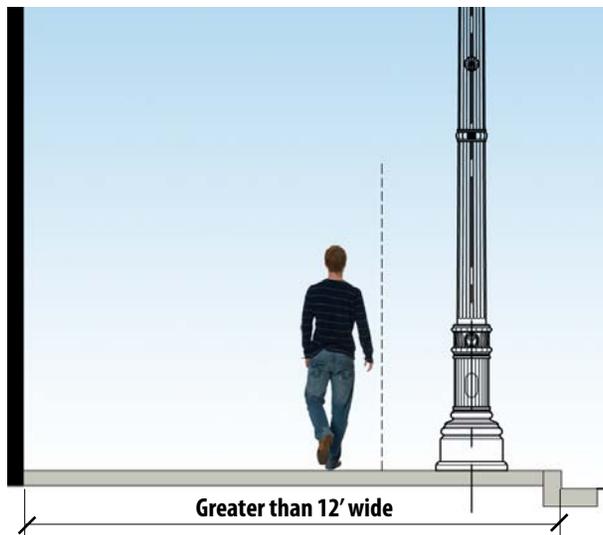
Shy zones in sidewalks greater than 12 feet wide
